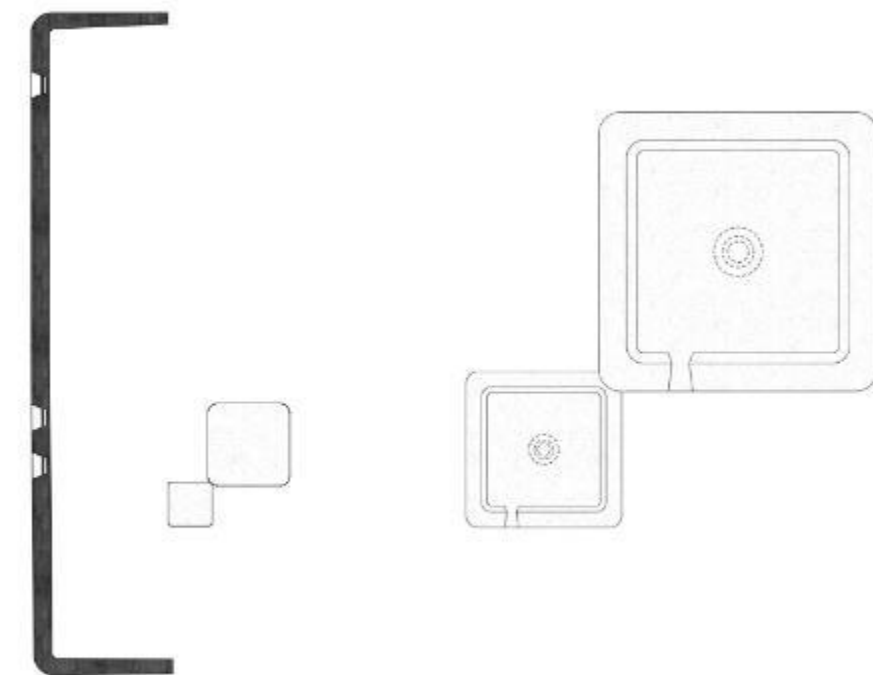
Plan drawing of exposed white concrete built-in furniture in the U-shaped wall in front of Kubbealti (Under The Dome) which are actually designed as massive ashtrays to collect cigarette wastes. (above) and reproduction for inclusion in Archive Box (below). (Produced by the Author)
